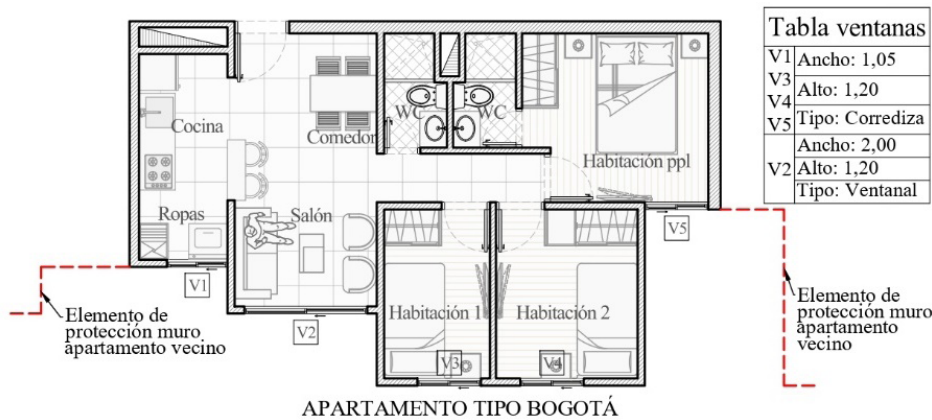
Architectural floorplans of standard housing for Bogotá, indicating the location of openings and obstructions. Source: Preparation by the authors.
